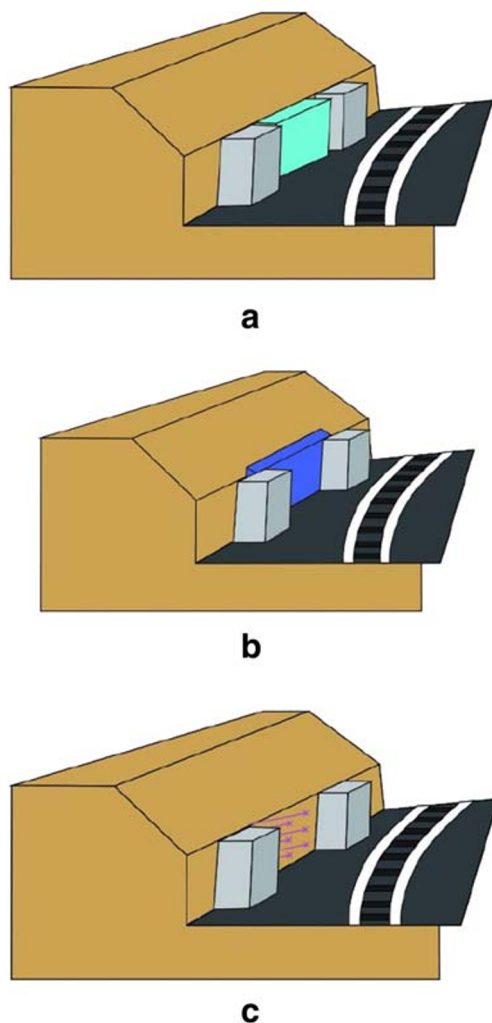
Composite retaining structures. a Stabilizing piles with retaining wall. b Stabilizing piles with cantilever wall. c Stabilizing piles with soil nail wall
